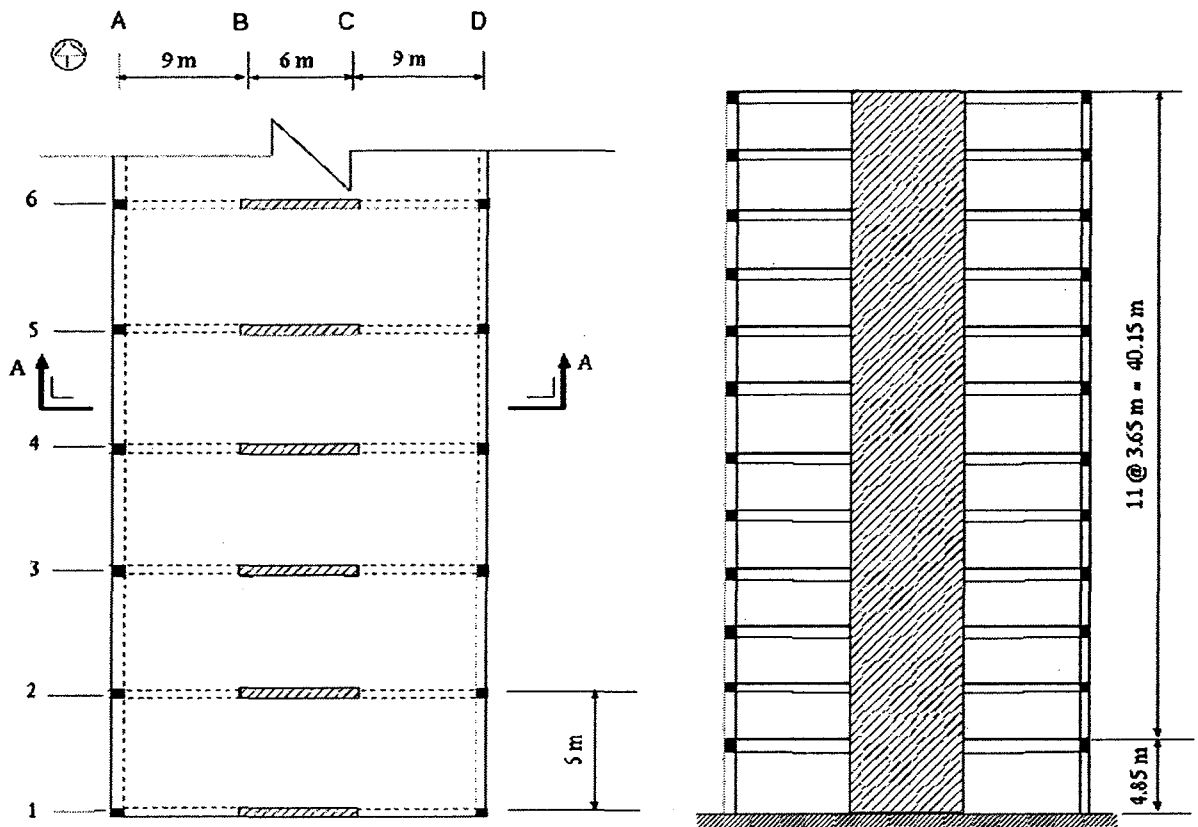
Layout of the building with shear wall (a) plan, and (b) elevation
